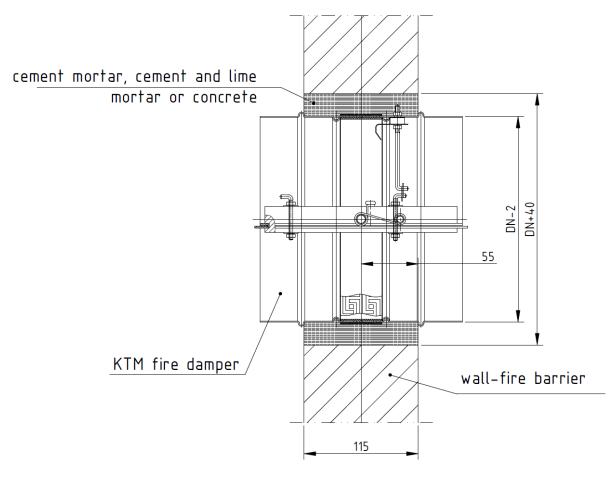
Installation of fire damper KTM (male coupling) in rigid wall barrier
